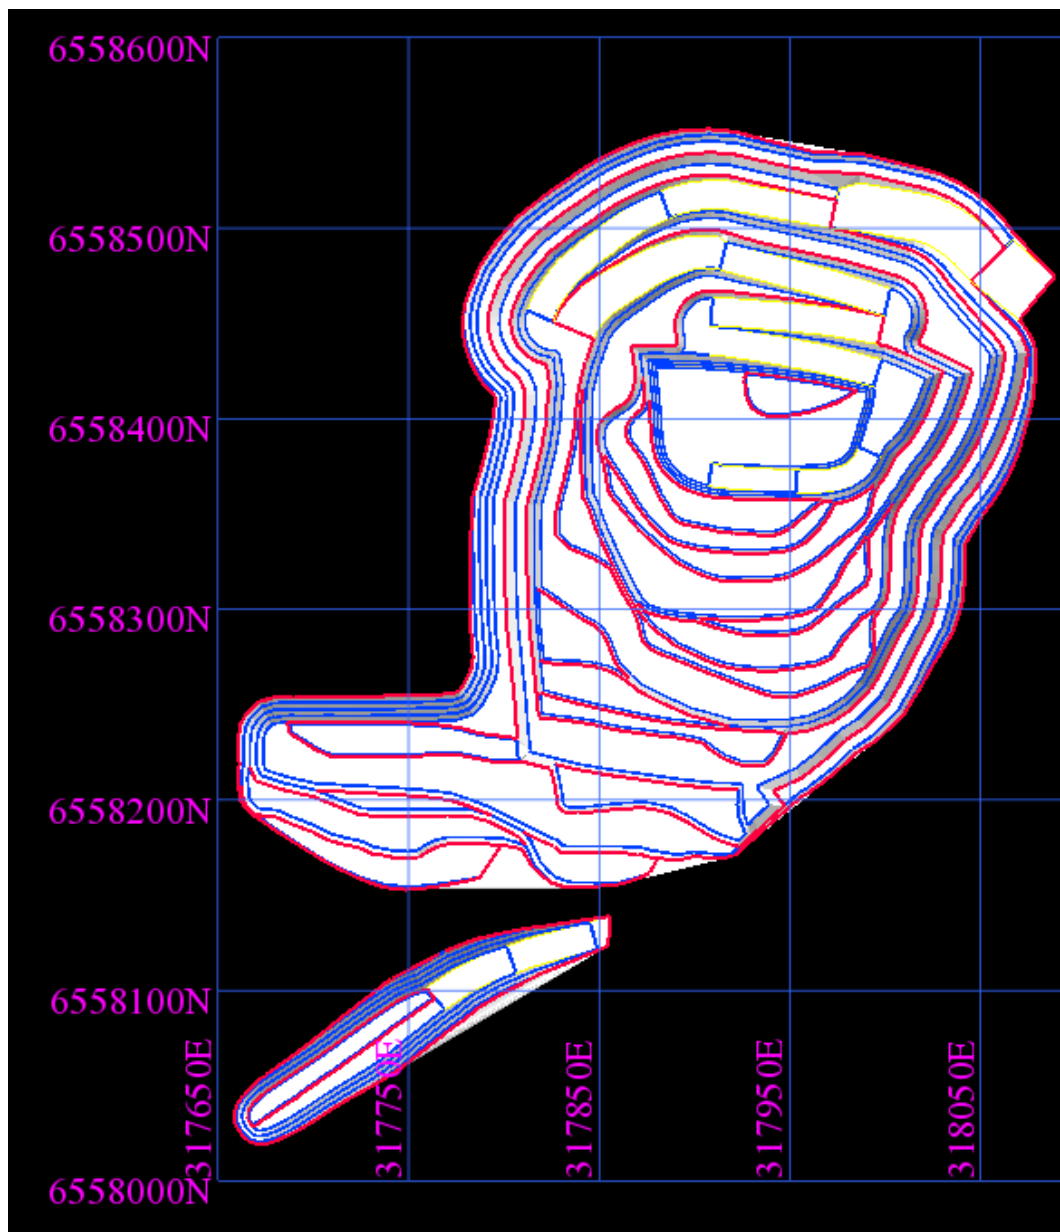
Big Red and Rocky Pit Designs in Plan View
